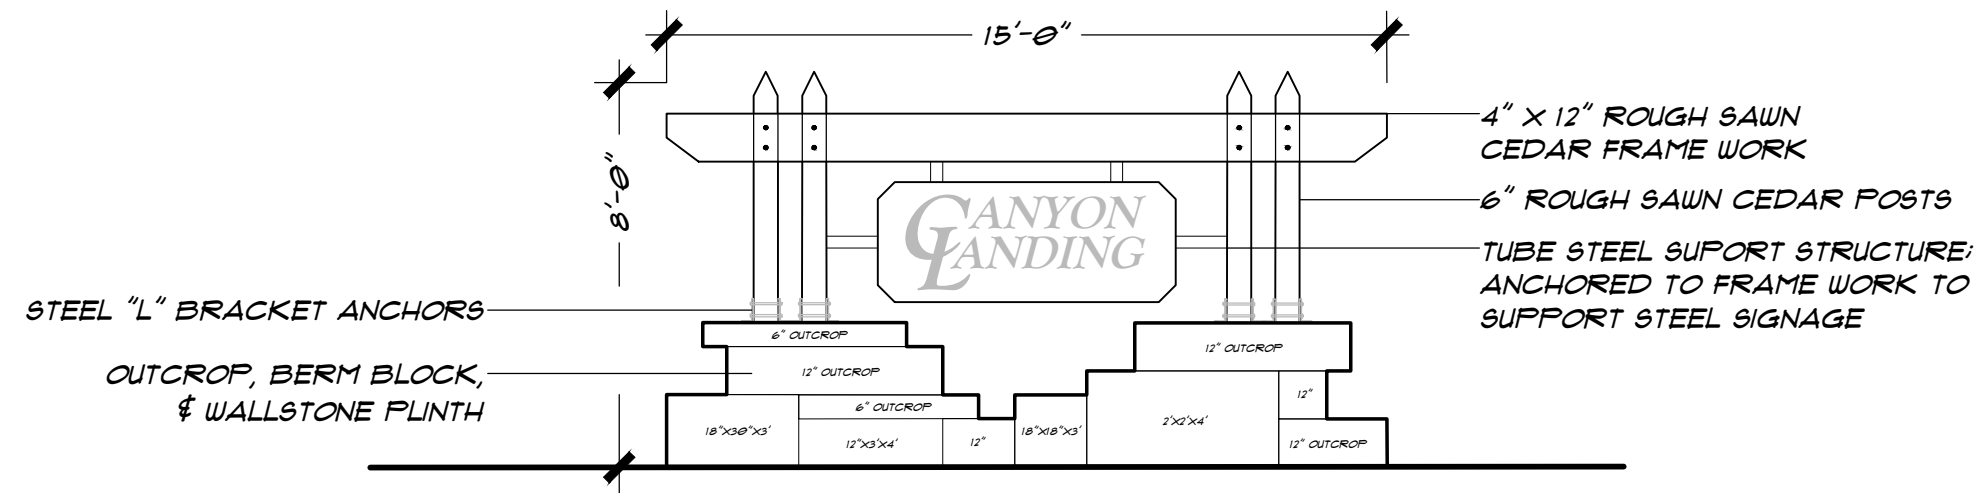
SECTION ELEVATION - 1/4" = 1'-0"
